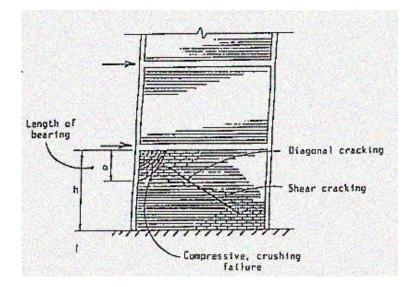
Modes of failure of Masonry Infilled Walls
